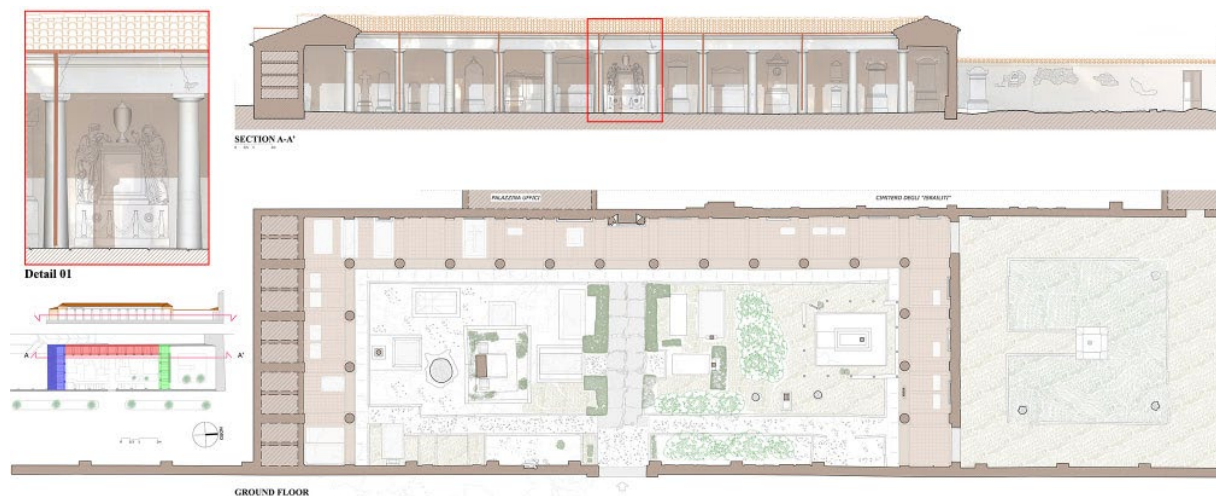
Plan, elevation of one side and detail of the cloister, scale 1:50 and scale 1:20.
